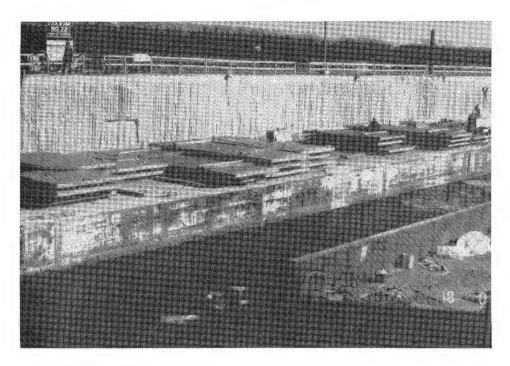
Condition of lock wall after removal of concrete. Precast panels on barges in lock chamber, Lock 22
